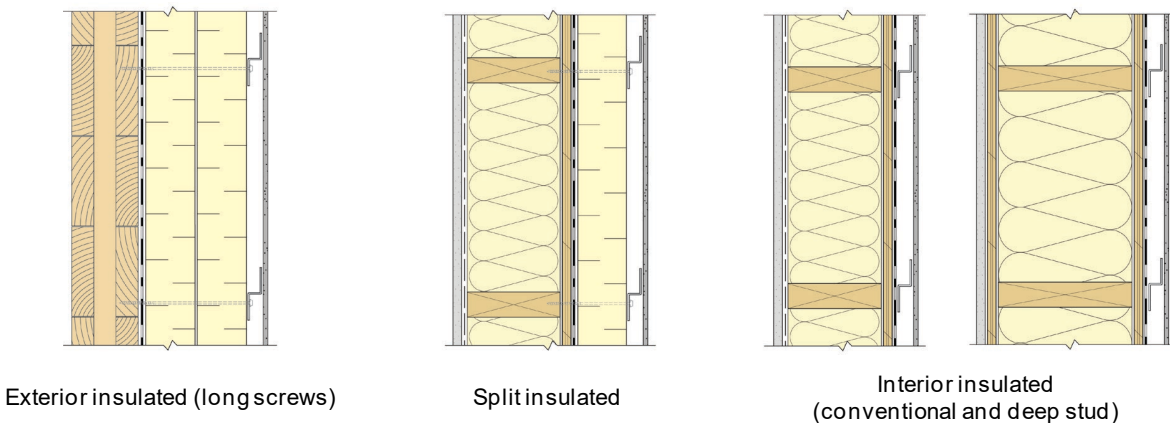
Options for placement of thermal insulation within light-wood-frame and mass timber wall assemblies.
